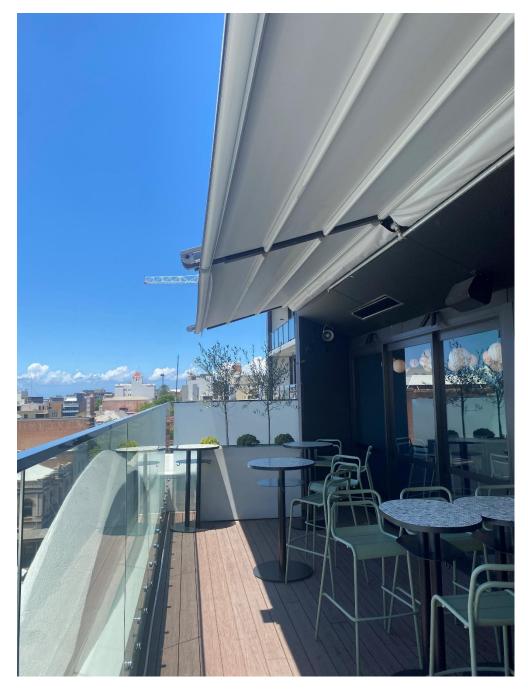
Current Eastern Boundary Barrier on Outdoor Terrace
